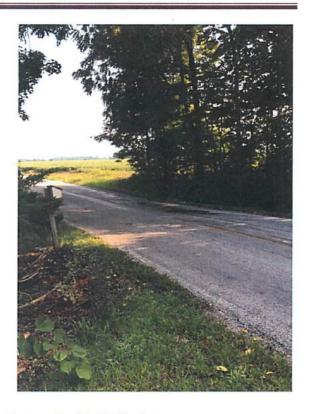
& 10 - Serious Pavement Failures at Isolated Locations
